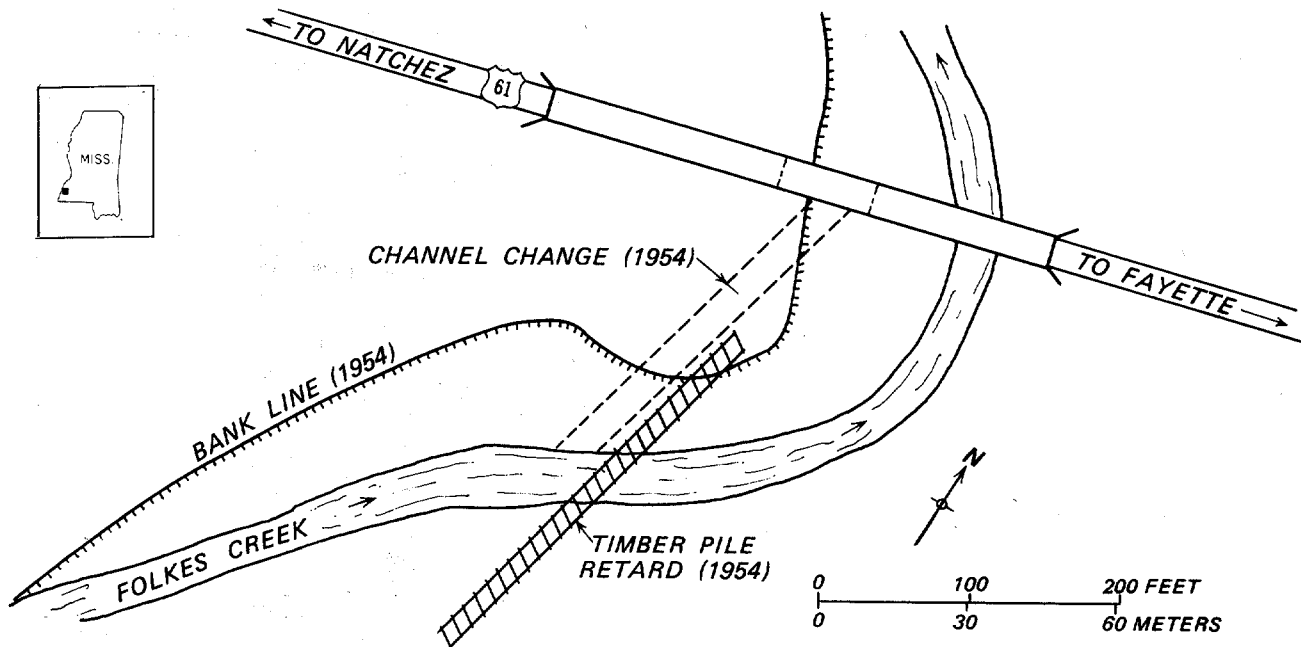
Plan sketch showing channel change and retard as constructed in 1954.
